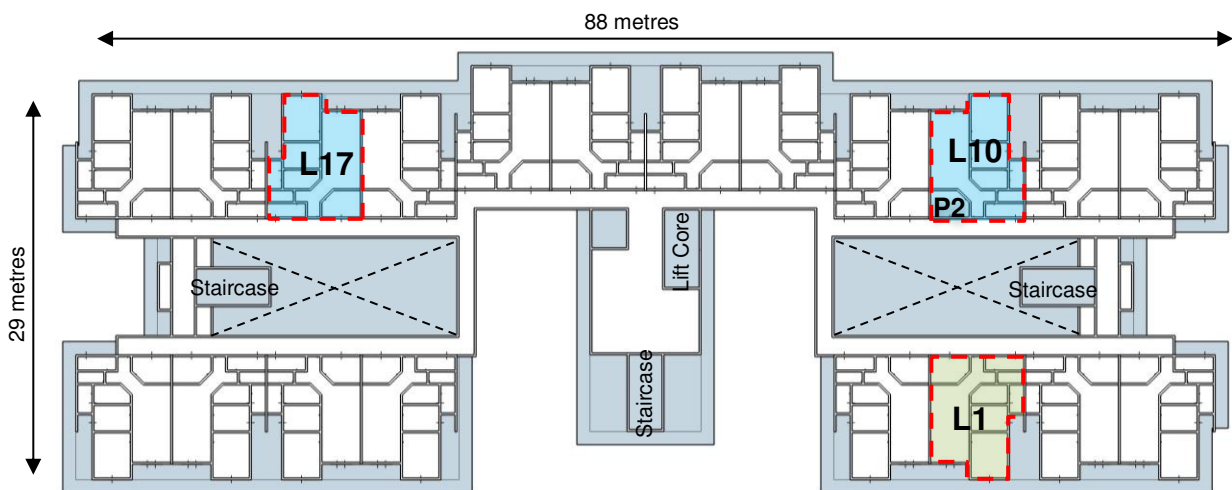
Typical Floor Plan of PPR Beringin (First Generation)
